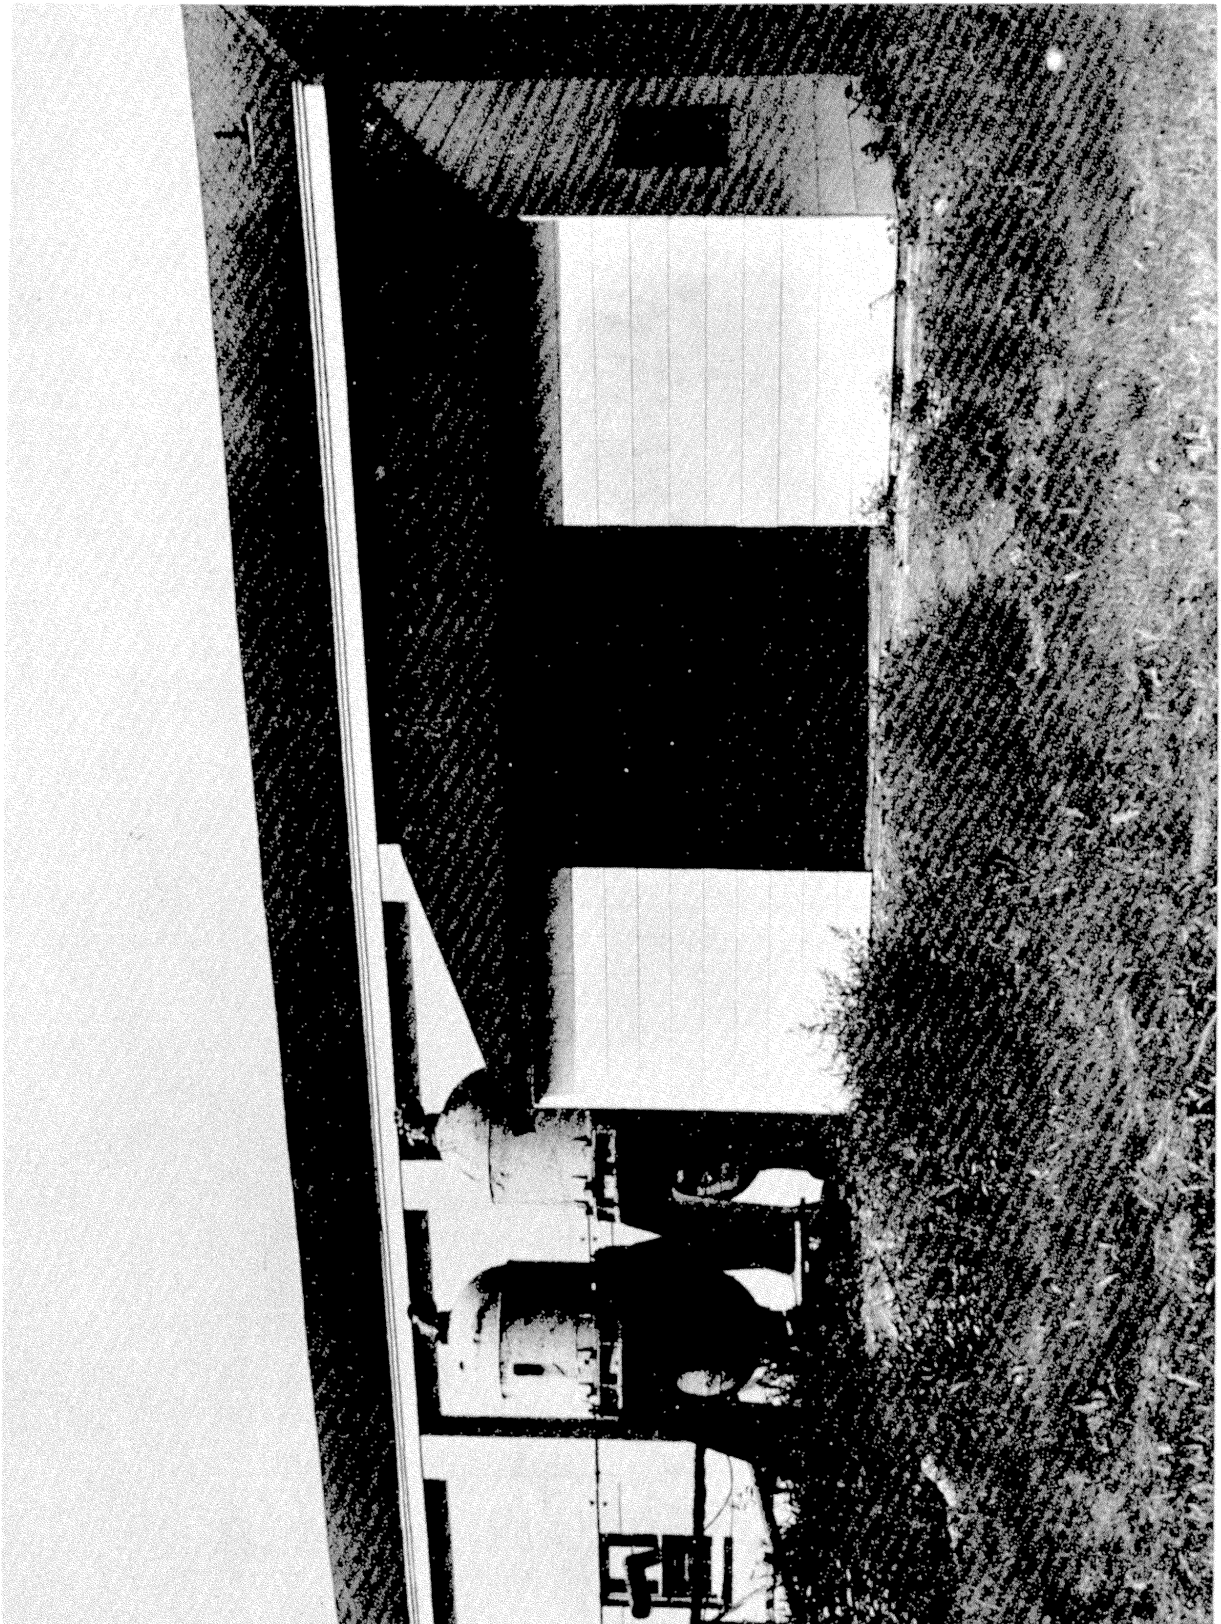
AIR COMPRESSOR SHED AND TANKS
